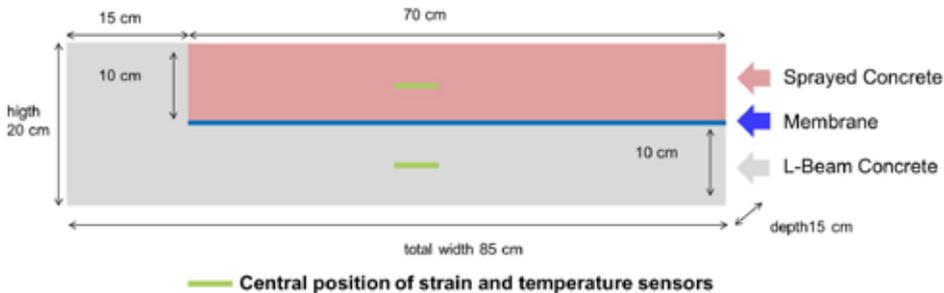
Schematic drawing of the cast L-beam as base, with sprayed membrane and sprayed concrete.
